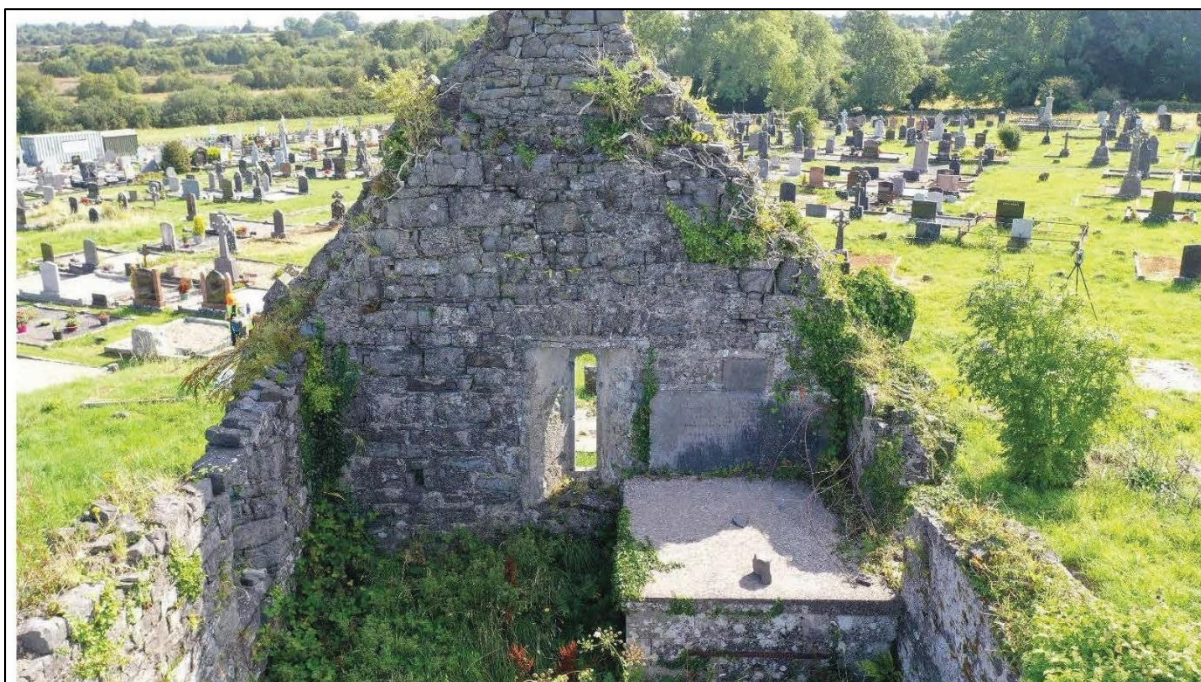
Sketch G: Orthophoto of south Wall to be carried out in phase 1 (2m at SE corner)
